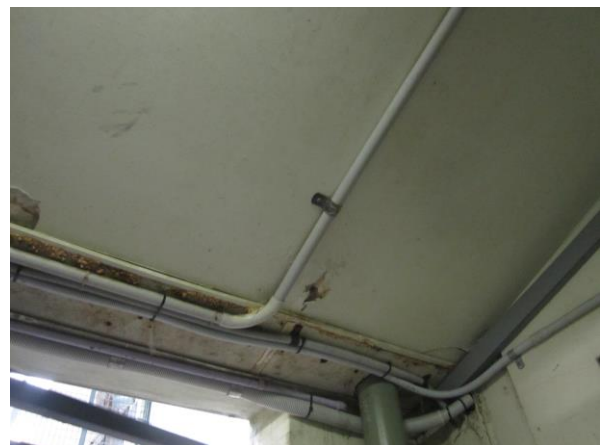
Snow Leopard, entrance to back of house area, ceiling
